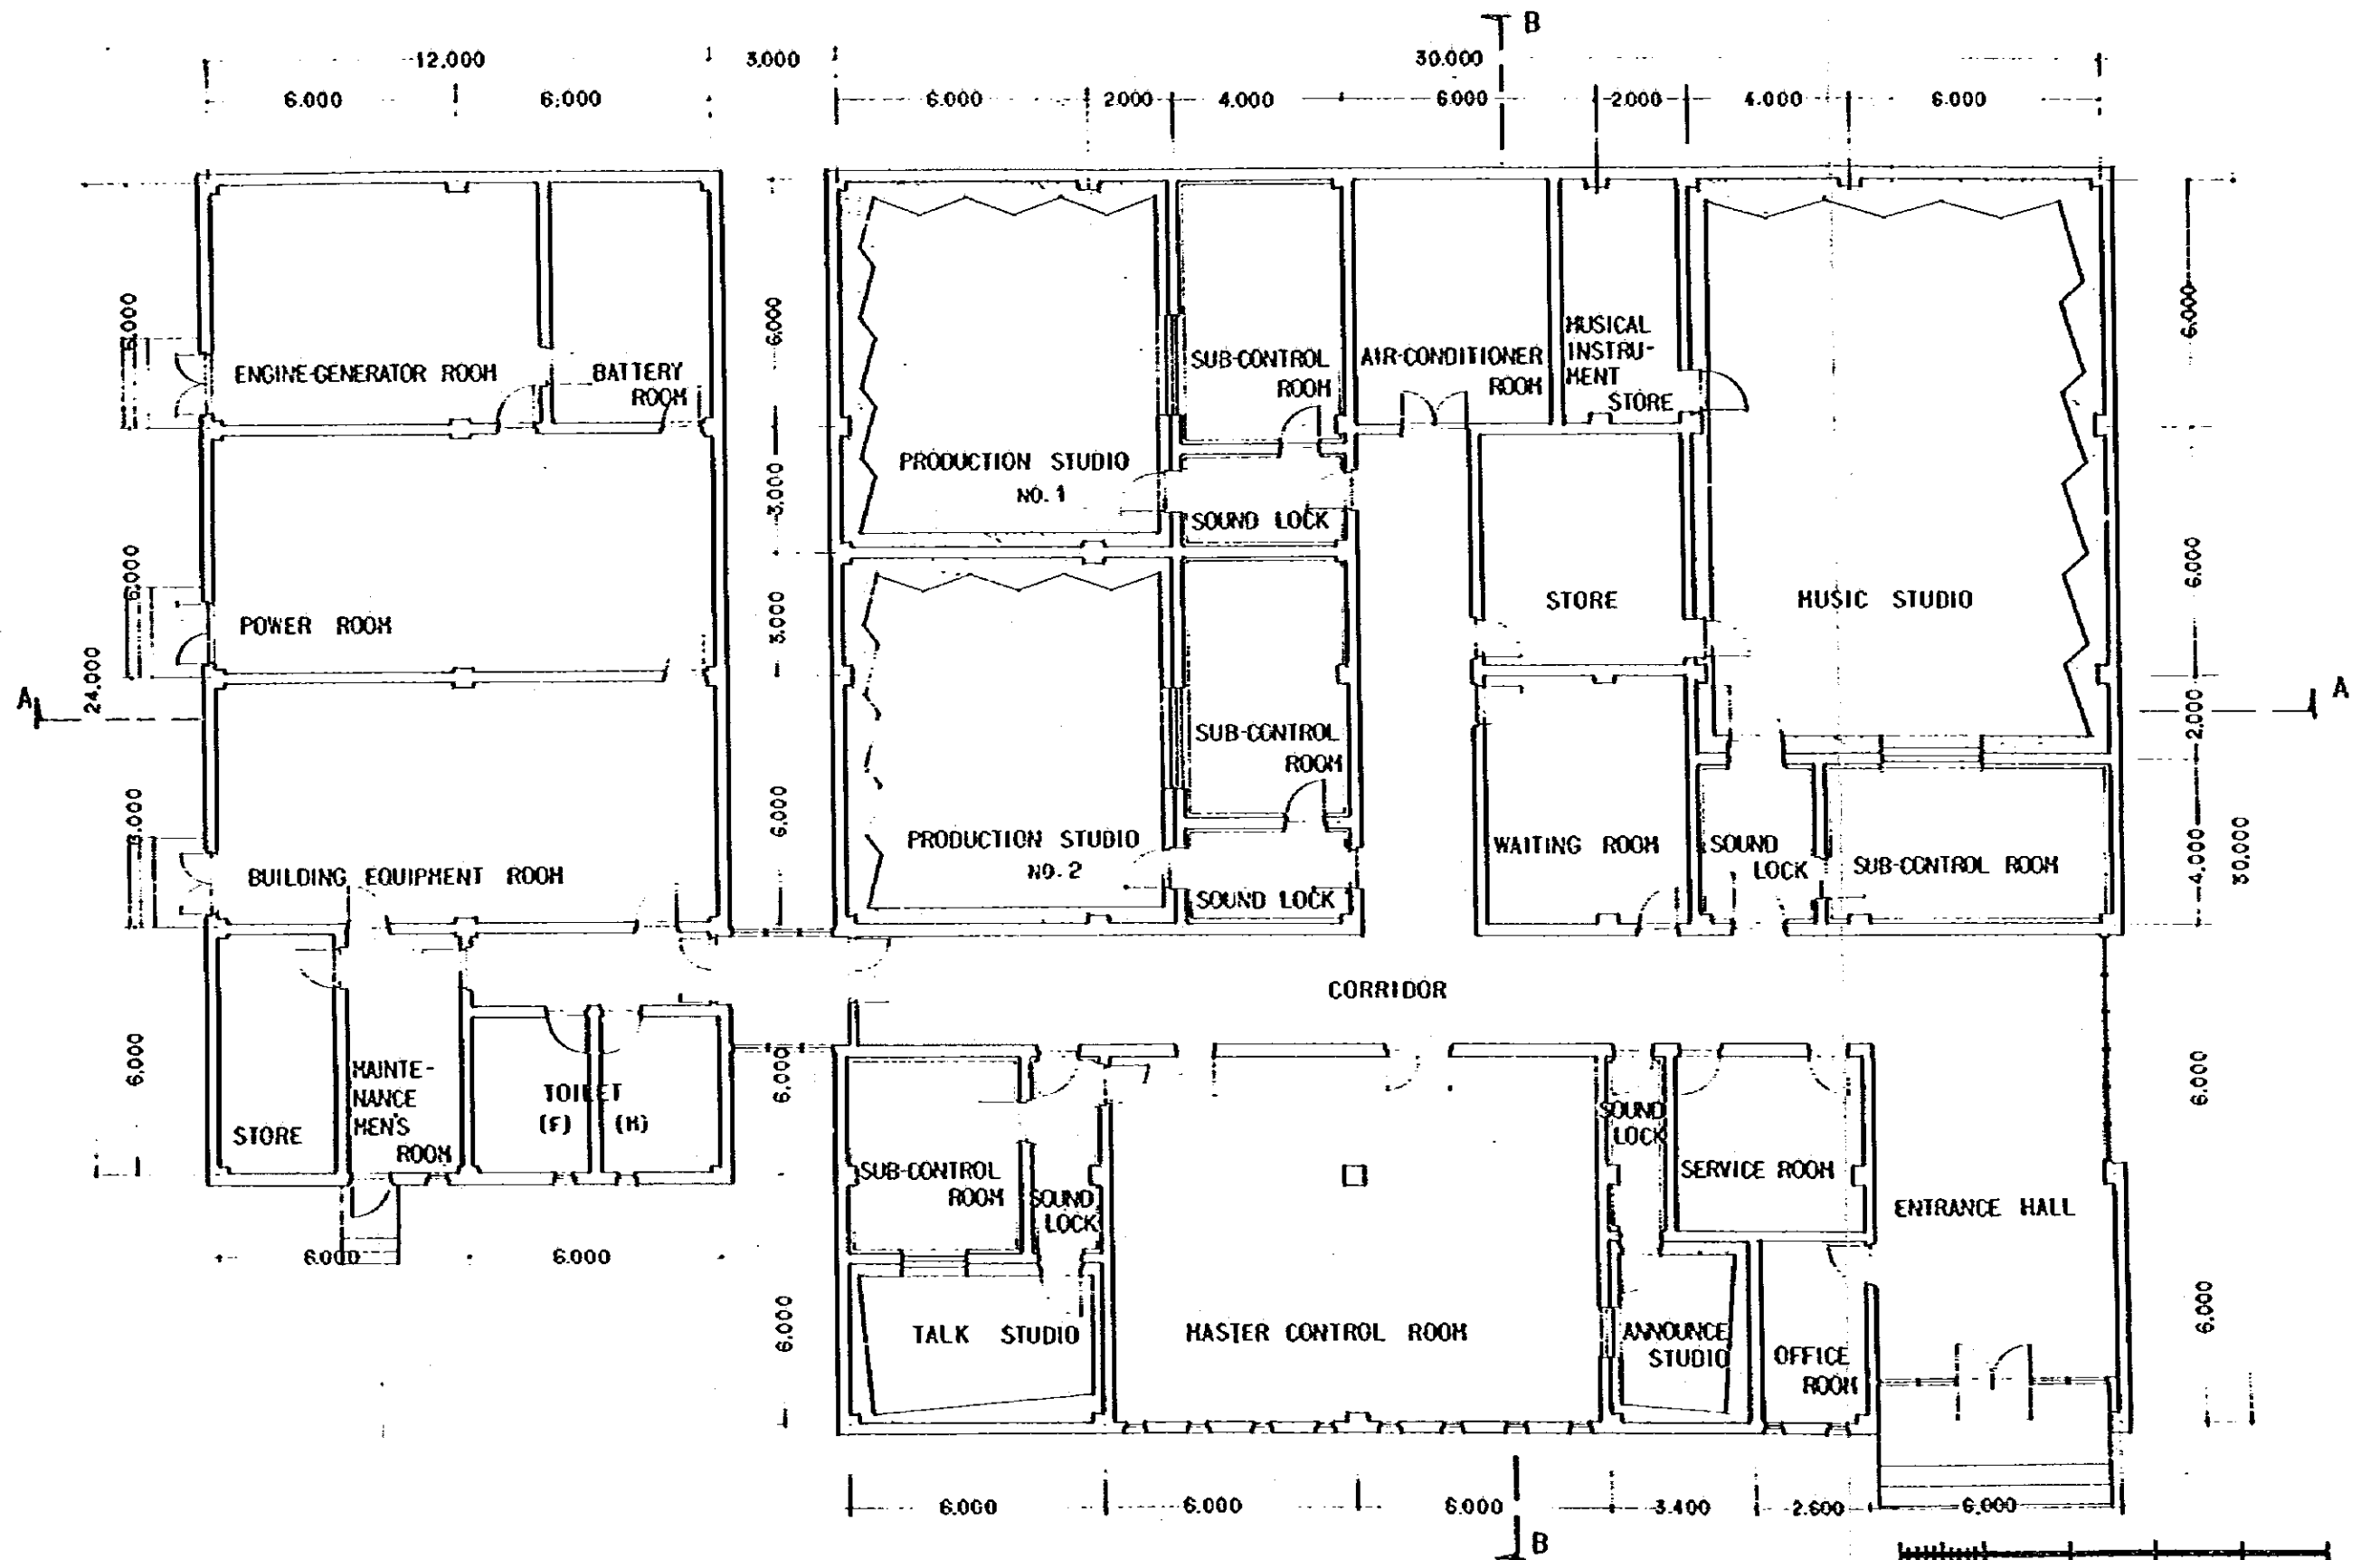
FLOOR PLAN — KATHMANDU STUDIO CENTER
